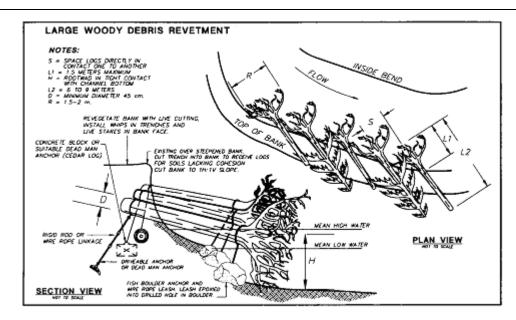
Typical large woody debris revement installation (Slaney & Zaldokas, 1997).
